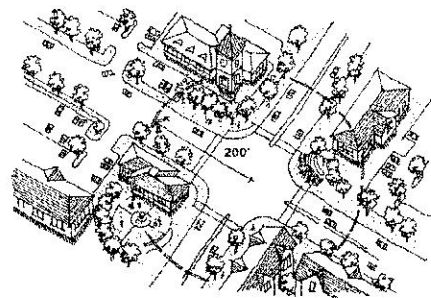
On four corners of a thoroughfare/thoroughfare street intersection, developments shall provide a "focal point" within a 200-foot radius from the intersection of the centerlines of the two intersecting thoroughfare streets.
